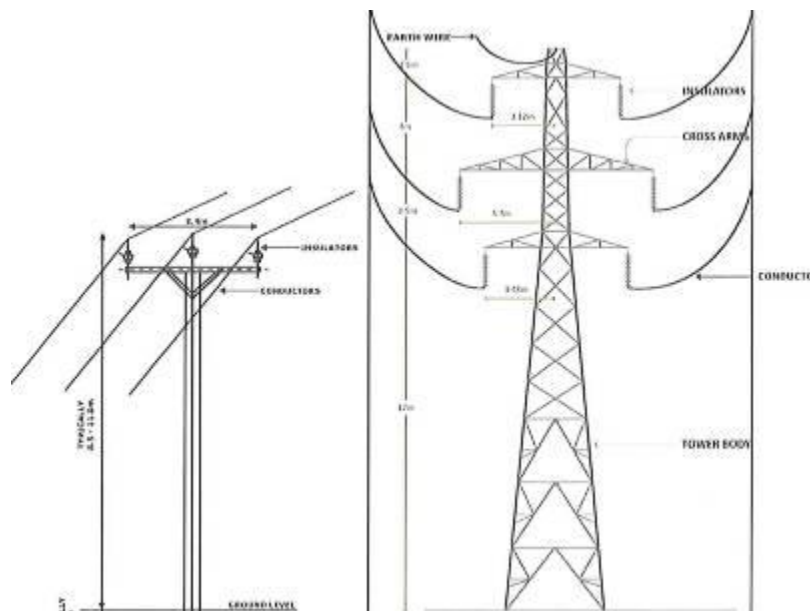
Typical design detail of wood pole adjacent to steel lattice tower (both as seen from ground level)
